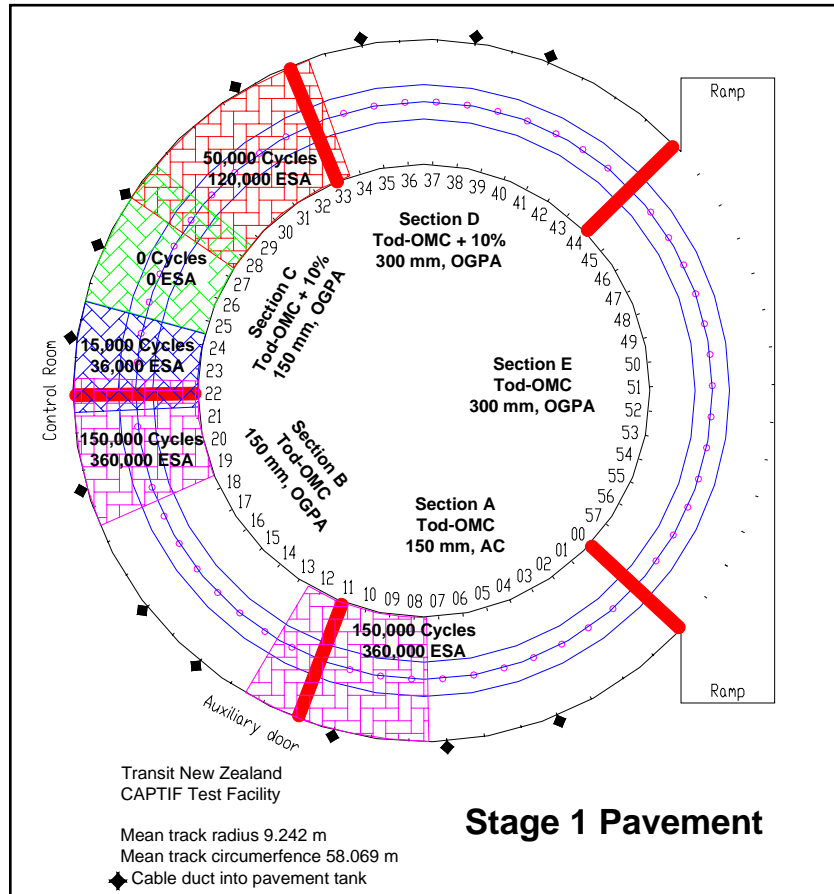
Positions of pavement failures on Sections A-E.
